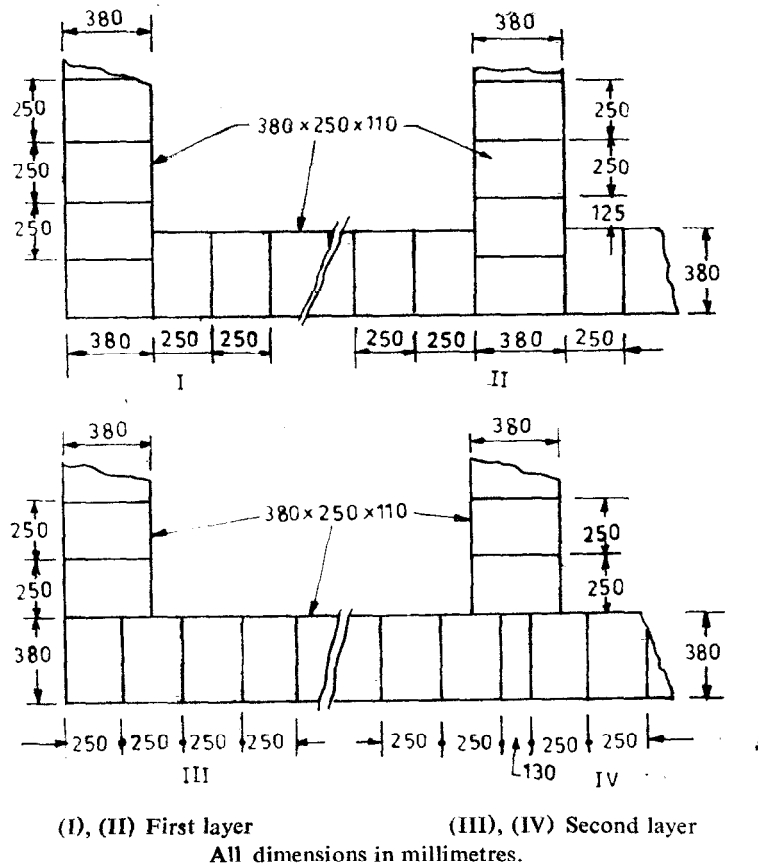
TYPICAL BOND DETAILS IN ADOBE WALL
